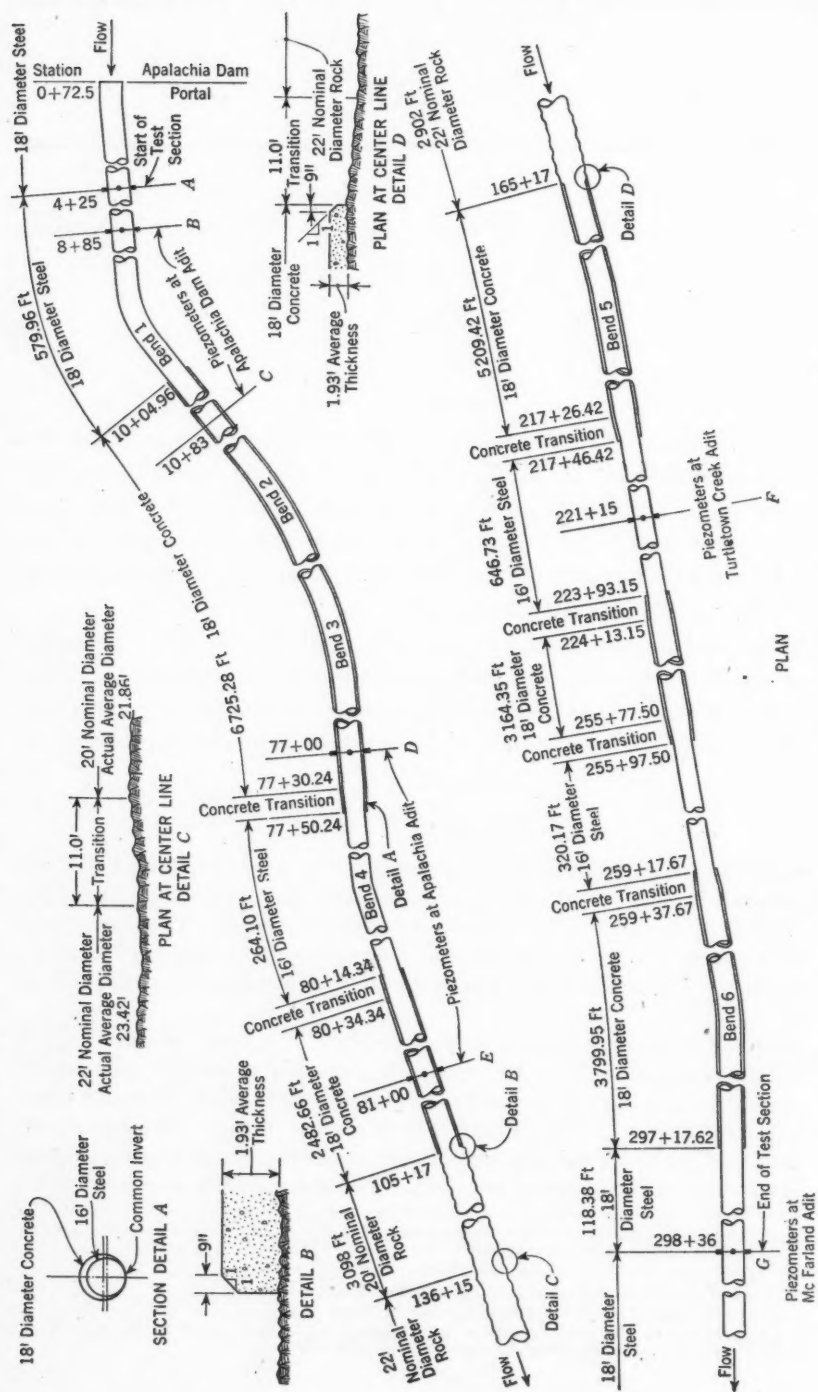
PLAN OF TEST SECTION OF APALACHIA TUNNEL SHOWING DETAILS OF LINING AND ALIGNMENT
